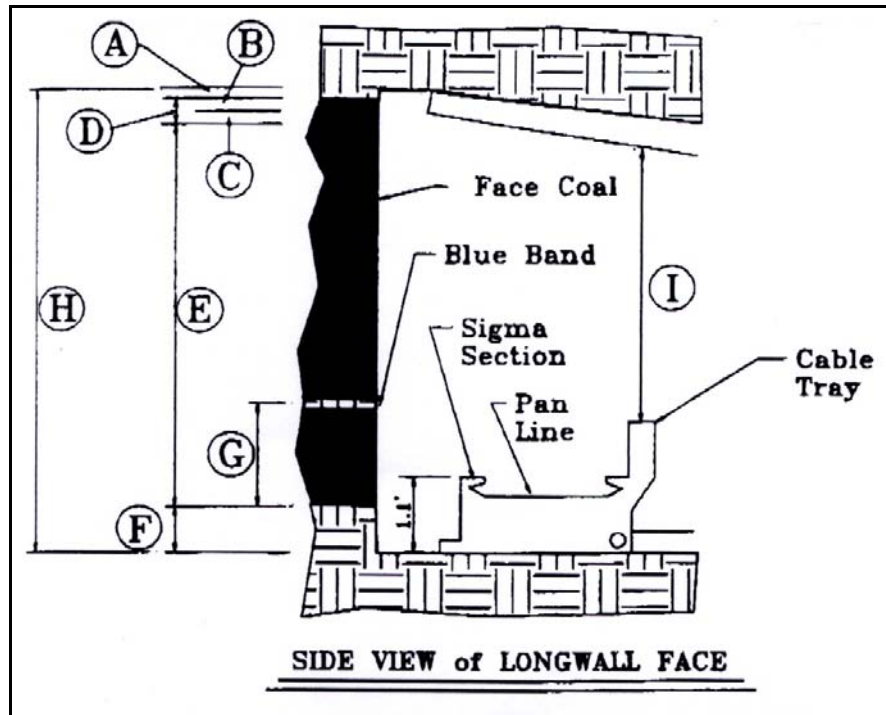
Cross-sectional diagram of the 8E/1N longwall panel face
